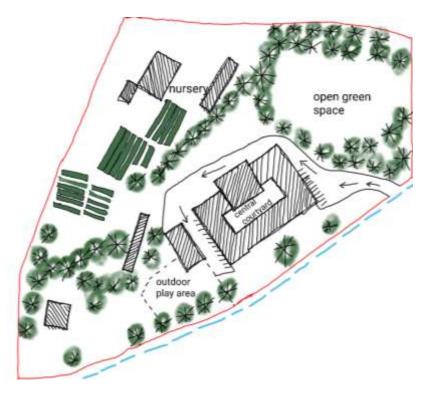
The sketch above shows a sketch layout site plan (Source: Author)
